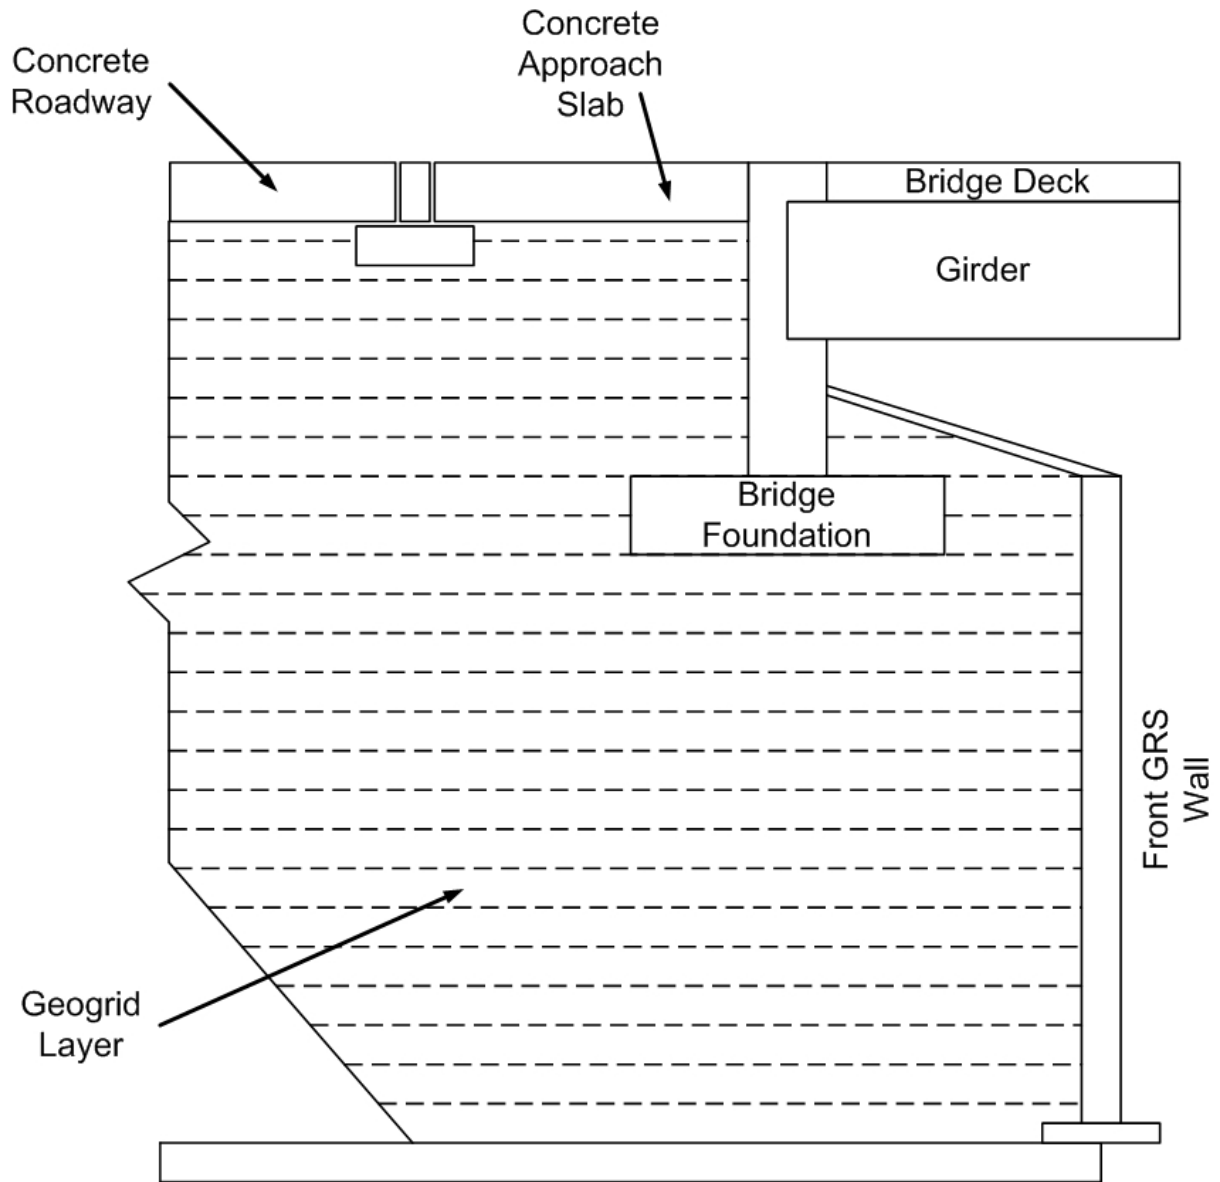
Section View of Less Common Abutment Types (Geosynthetic Reinforced Soil)
